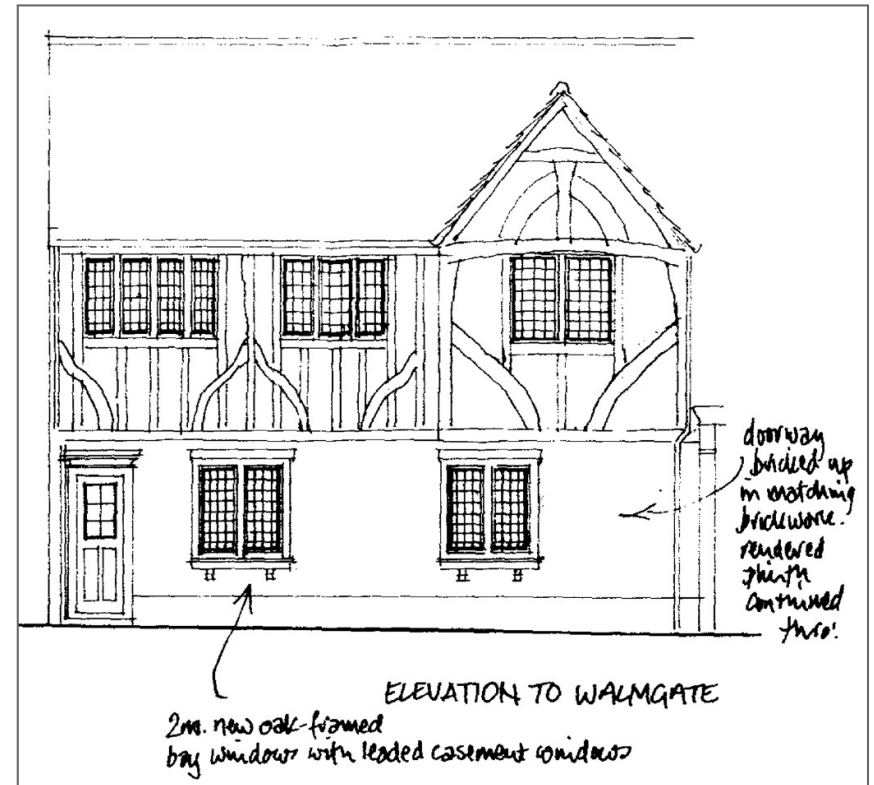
Detail from 2003 LBC application showing proposed alterations including infilling of western doorway and replacement of ground floor oriel windows. © Richard Parkin.
